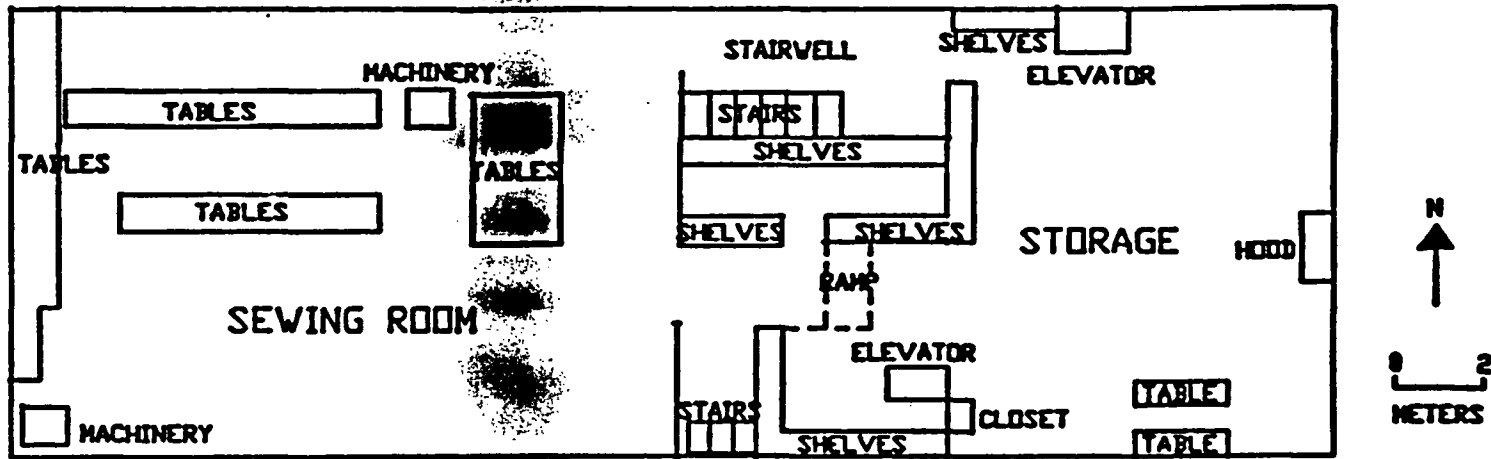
Floor Plan of the Sunflame Appliances Facility Second Floor.
